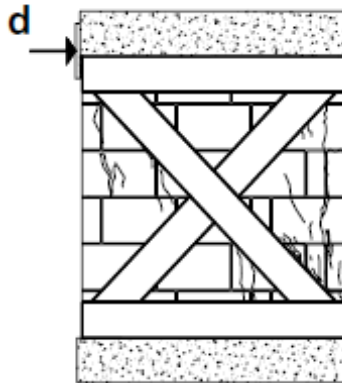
Crack pattern at failure for walls with high GFRP density (Marcari et al., 2007).
